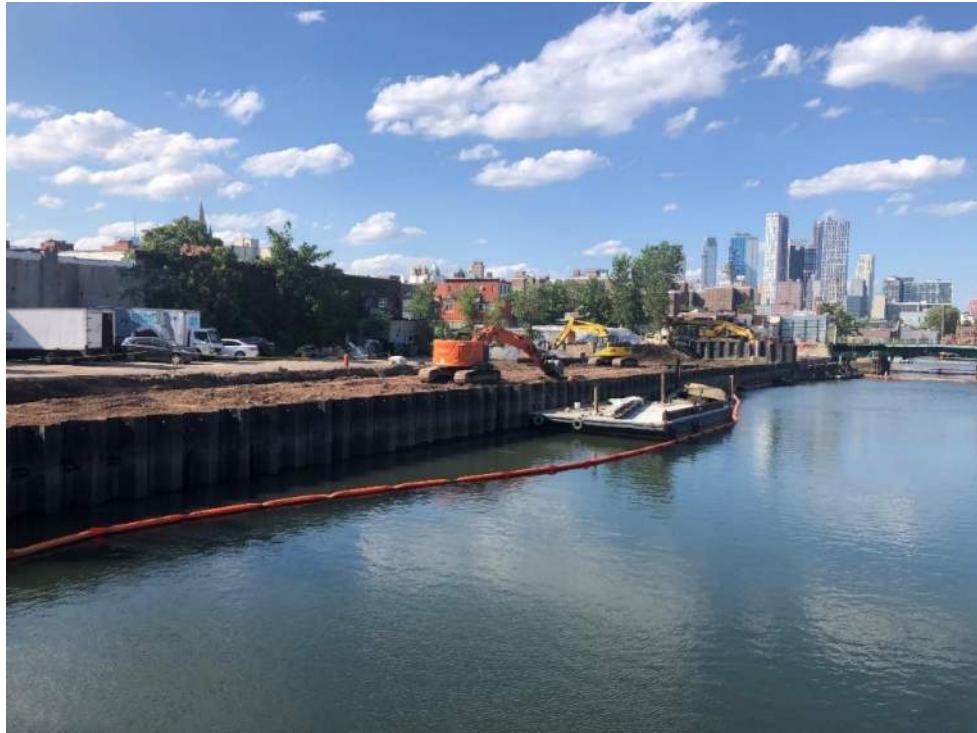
View of the site at the end of the day from the Carroll Street Bridge (facing northwest).
